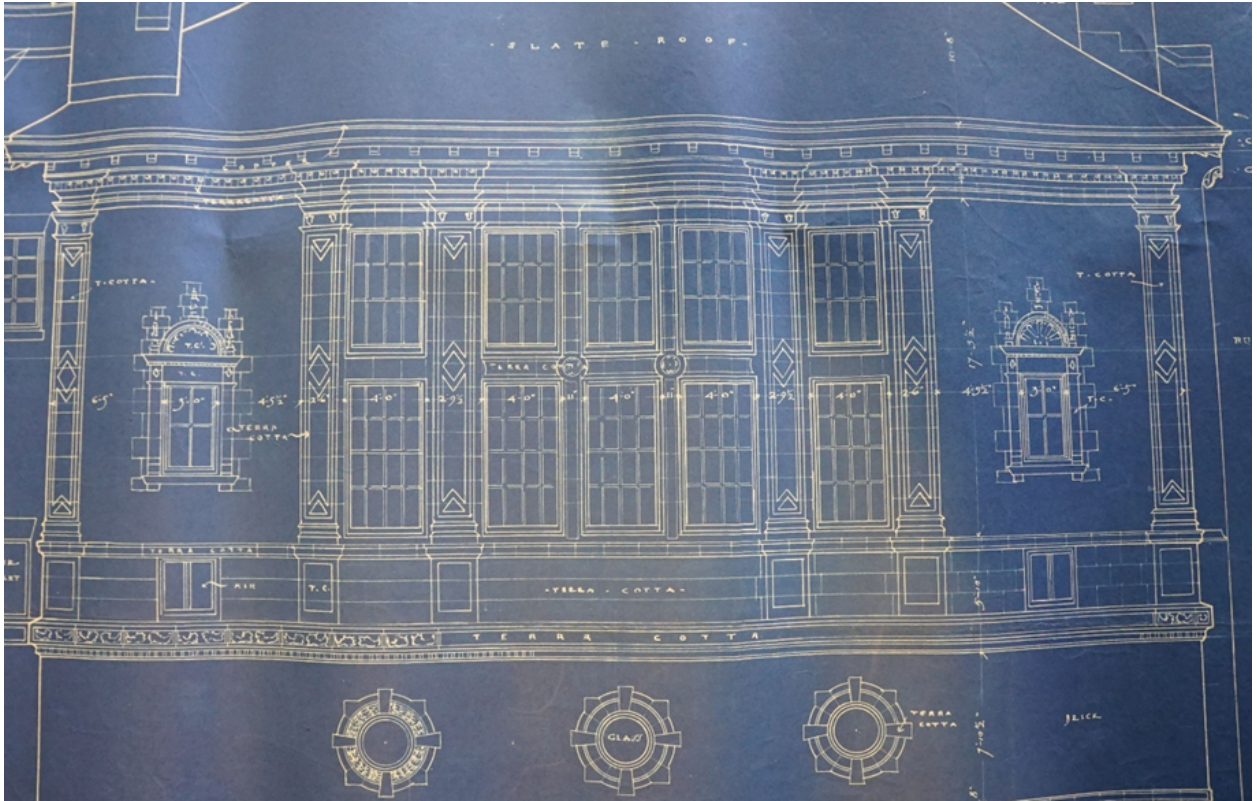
Detail of front elevation upper levels on 1903 architectural plans.
